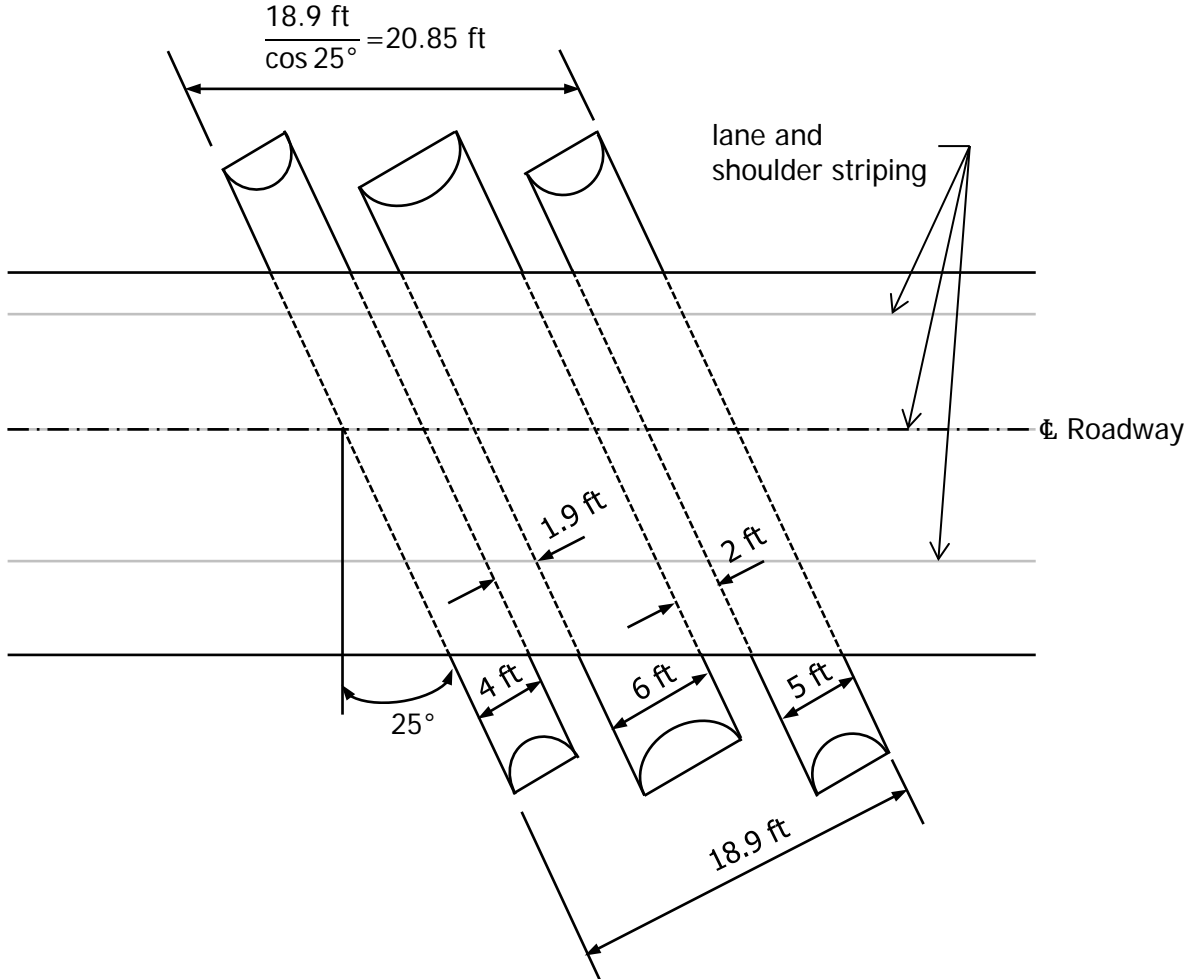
Plan view of a skewed, multi-pipe culvert under fill.
